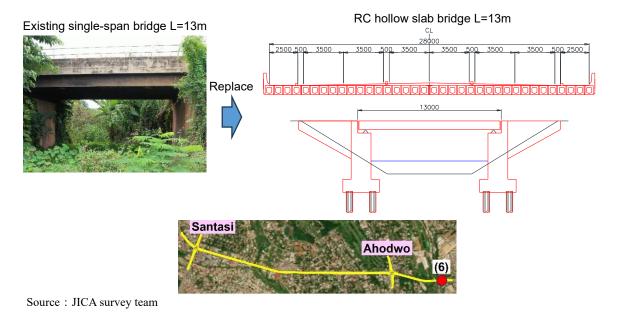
Structure (6): RC Hollow Slab Bridge L=13m
